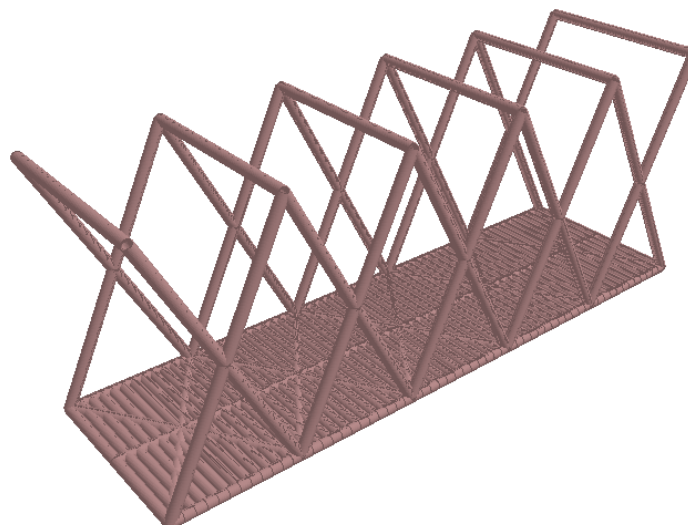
3D View of Pedestrian bridge made up of Bamboo with stiffener and cross stiffener - Case 6 (BC6)
